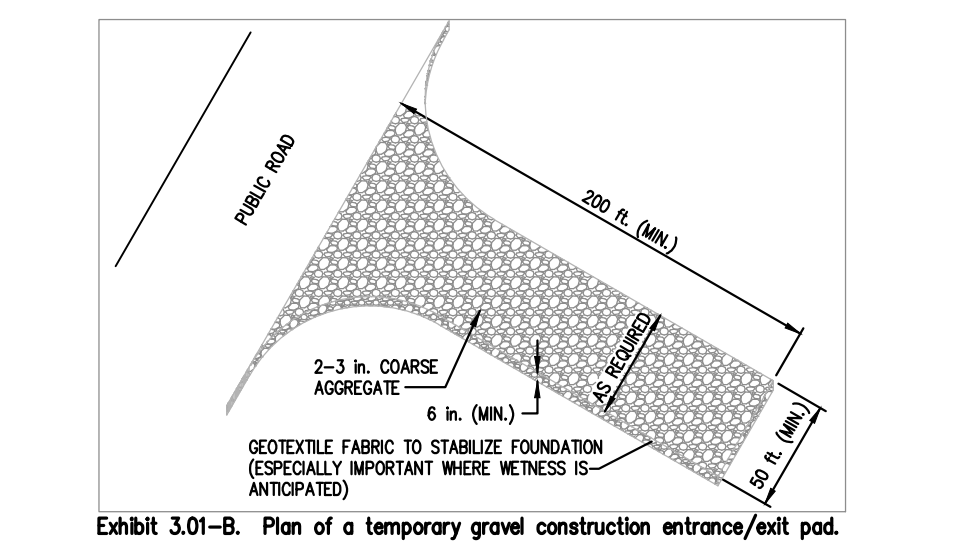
B. Plan of a temporary gravel construction entrance/exit pad.
